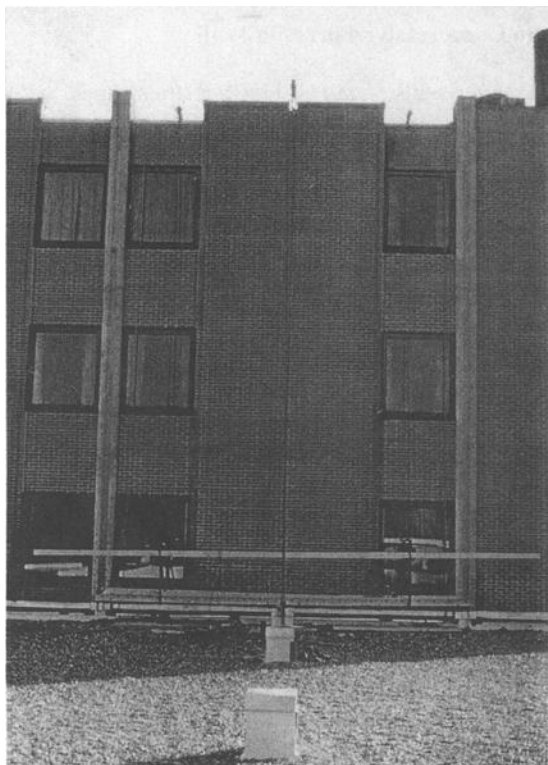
View of brick wall constructed between concrete columns on a long building
